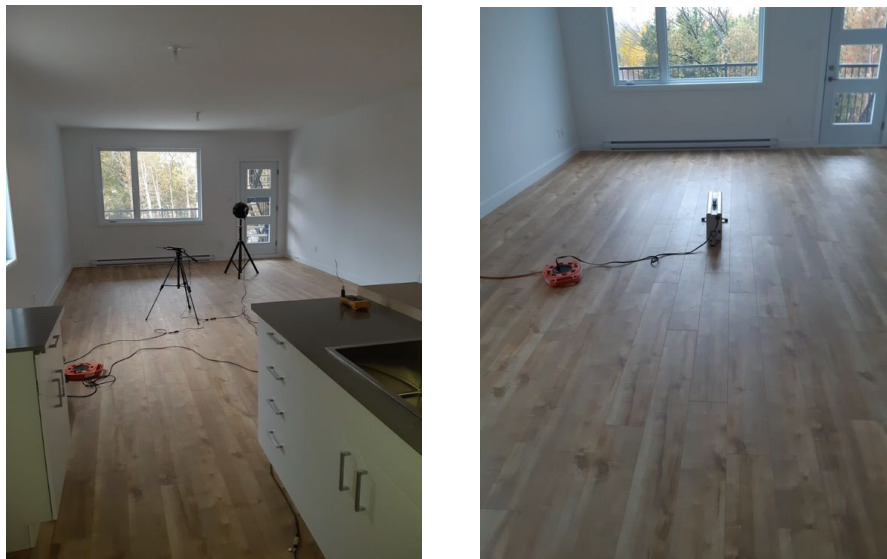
Testing airborne sound transmission through walls (left) and impact sound transmission through floors (right photo showing a tapping machine) in a residential suite.
